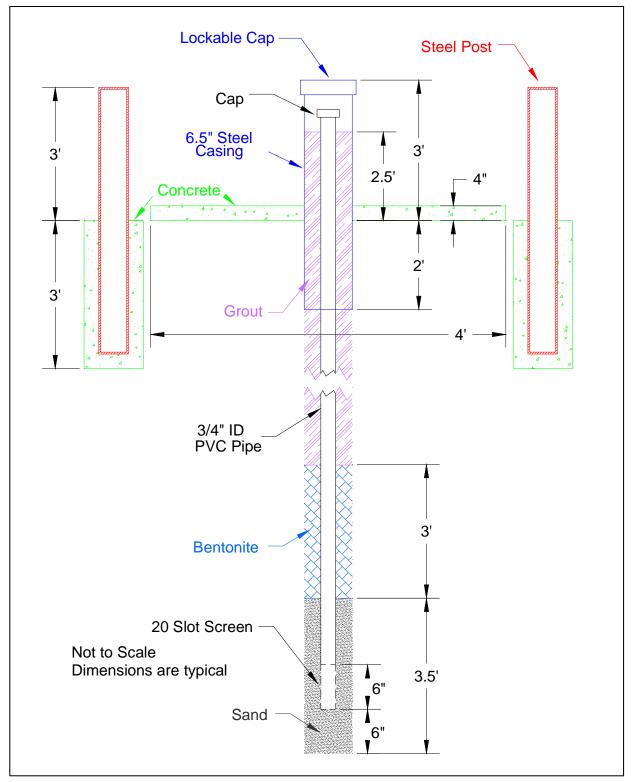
Typical Soil Gas Probe Construction Diagram
